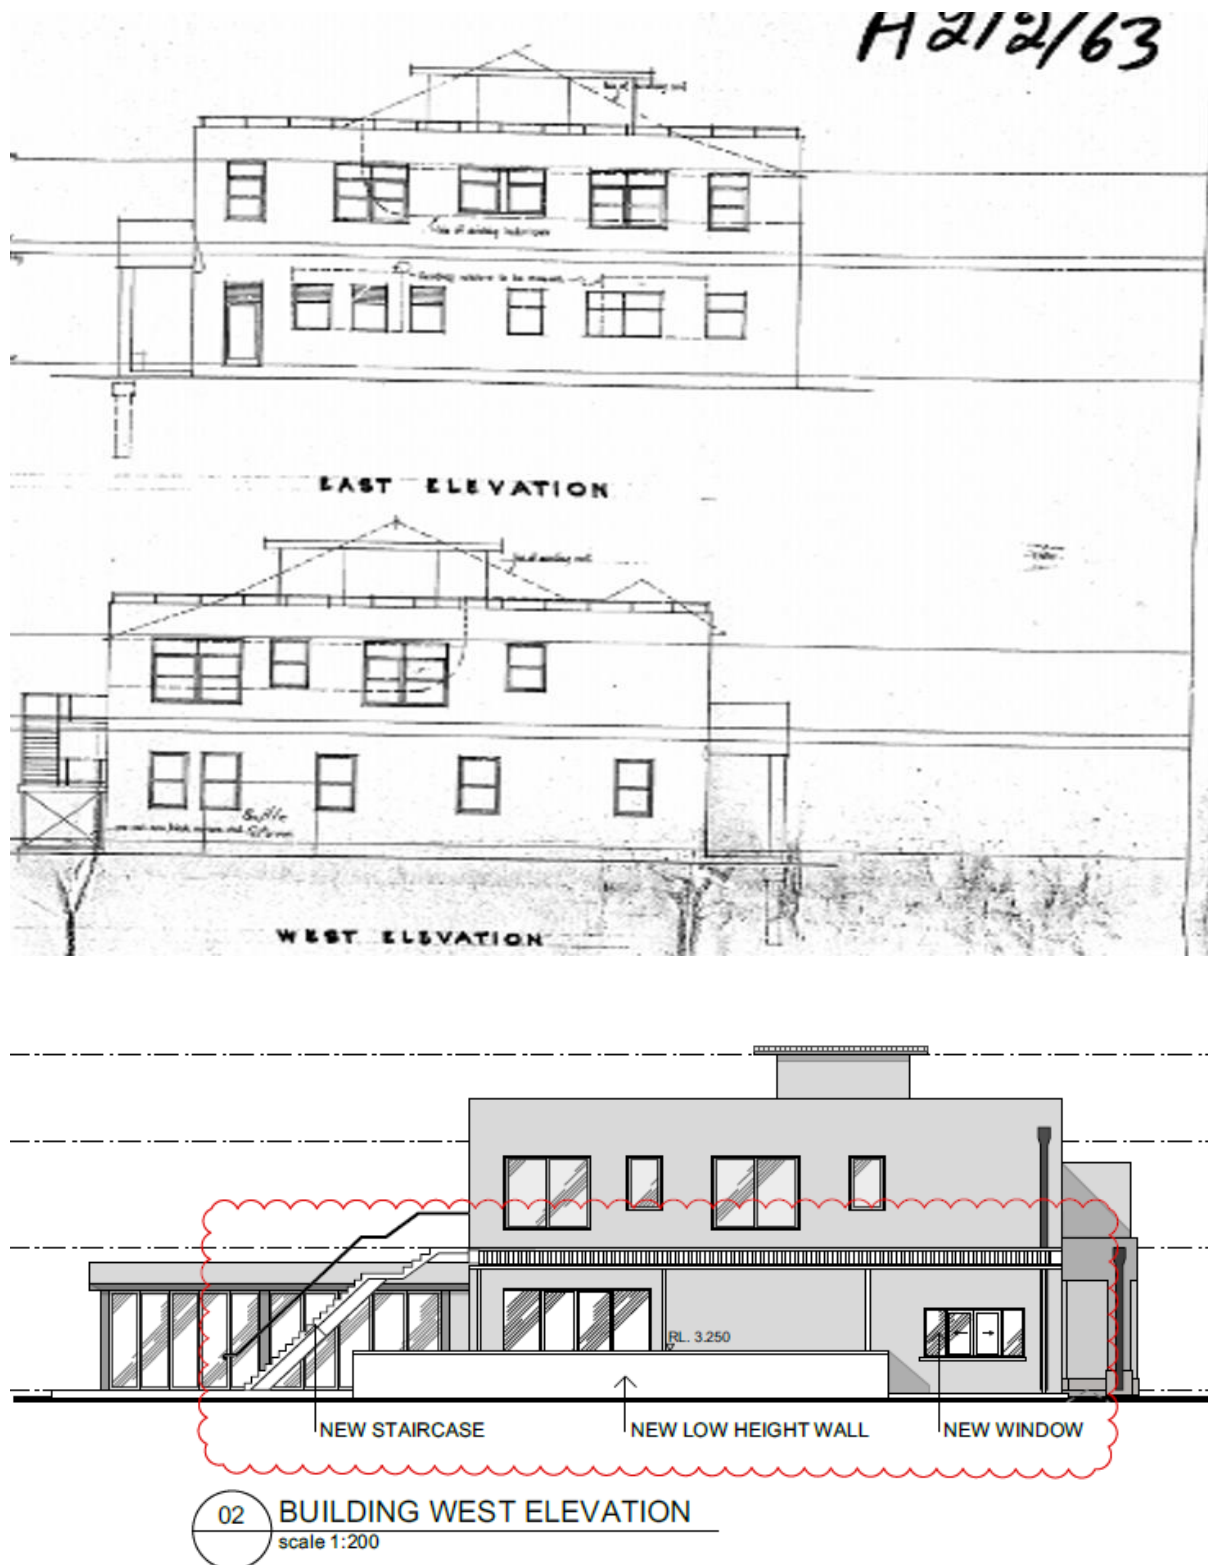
Western façade extract of 1963 deemed development consent (A212/63) and current 4.55(1A) plan
